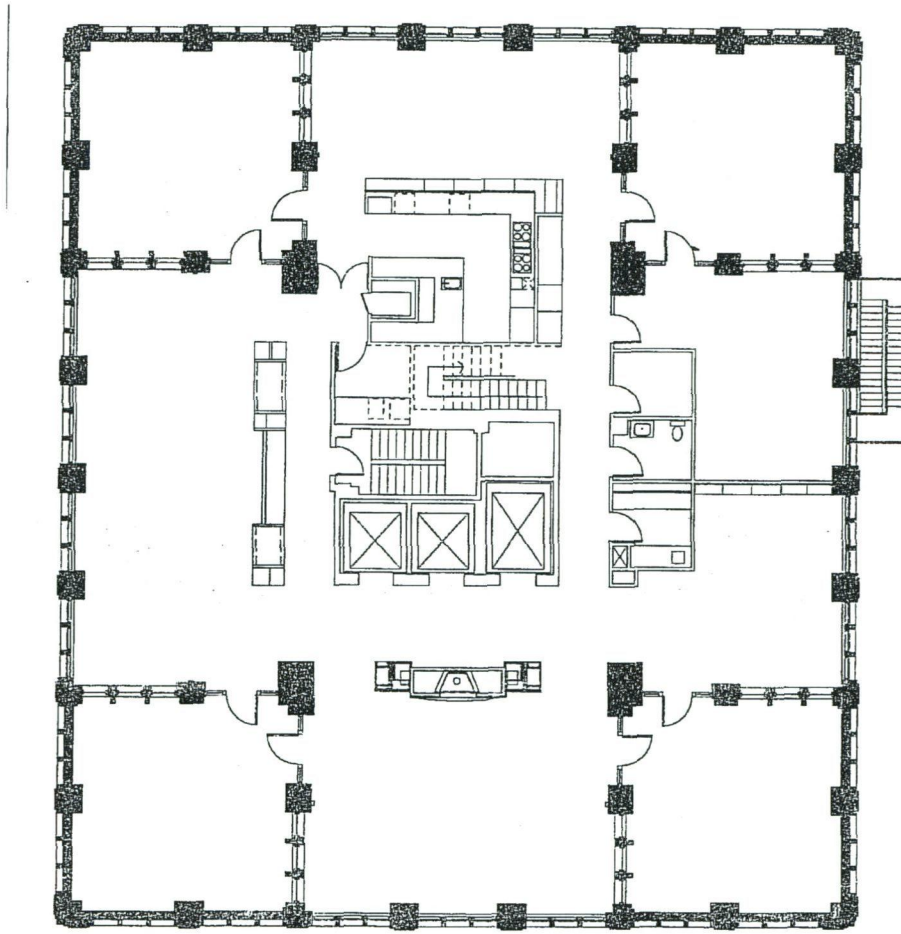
Fourth floor plan, typical through the thirteenth floor, 2005.
